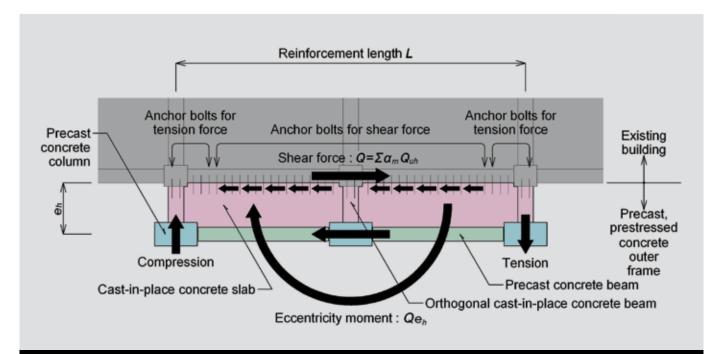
Shear transfer mechanism from building to exterior frame at floor slab. Note: e_n = distance between building and exterior frame; L = length between orthogonal beams of both ends; Q = shear force; Q_m = ultimate lateral load—carrying capacity of precast concrete columns of the next floor below; α_m = effective strength factor in precast concrete columns of the understory.
